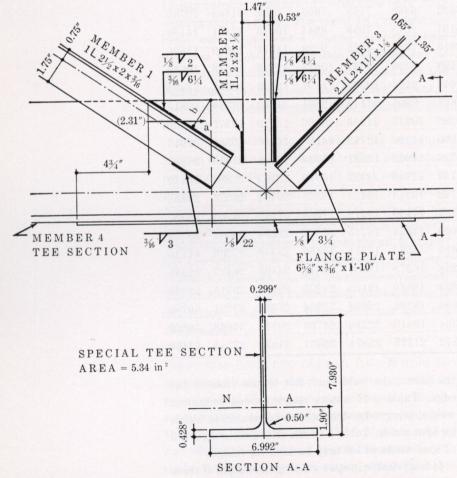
Typical welded joint design in aluminum. See Example 4-2, Page 99.
